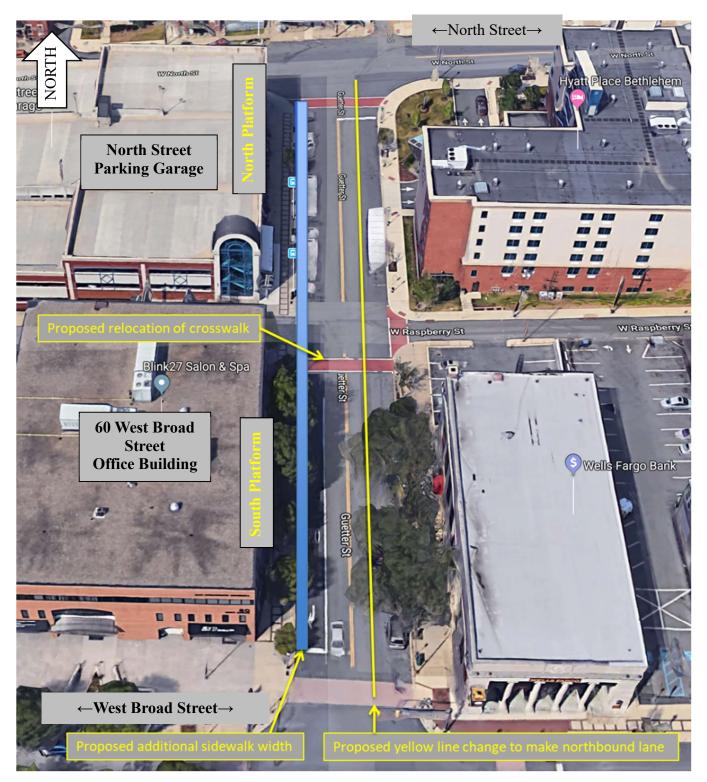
Location of the Bethlehem Transportation Center on the west side of Guetter Street (shown on the left). The waiting room is at the top left within the North Street Parking Garage. With the removal of parking on the east side on Guetter, the yellow centerline marking the northbound lane on the right can be moved. The space saved may be used to widen the sidewalk on the west side of Guetter about 6 to 8 ft, which will also shorten pedestrian crossing distance across Guetter Street. Figure also shows that the crosswalk at W. Raspberry Street should be move to the southern side of W. Raspberry St.
